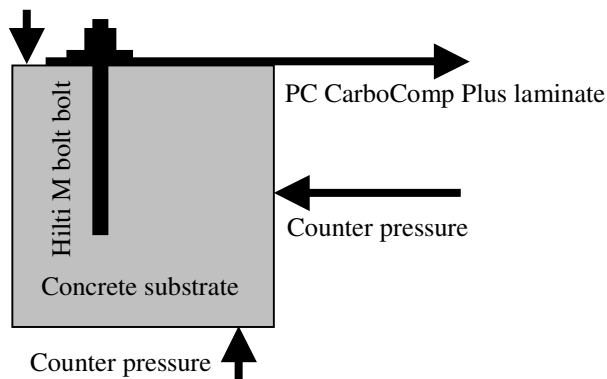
Test set-up for a single bolt anchored to the concrete.
